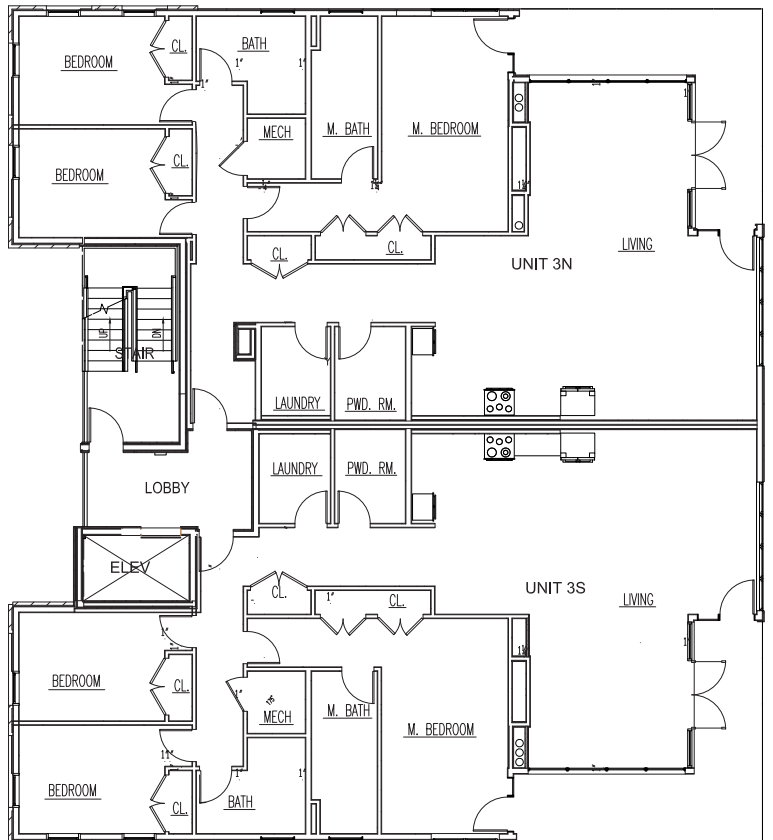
typical floor plan for 2514 Dexter Ave N ("Plan Review No. 77554, Automatic Sprinkler System, 2514 Dexter Avenue North - Dexter Avenue Condominiums" 2021).
